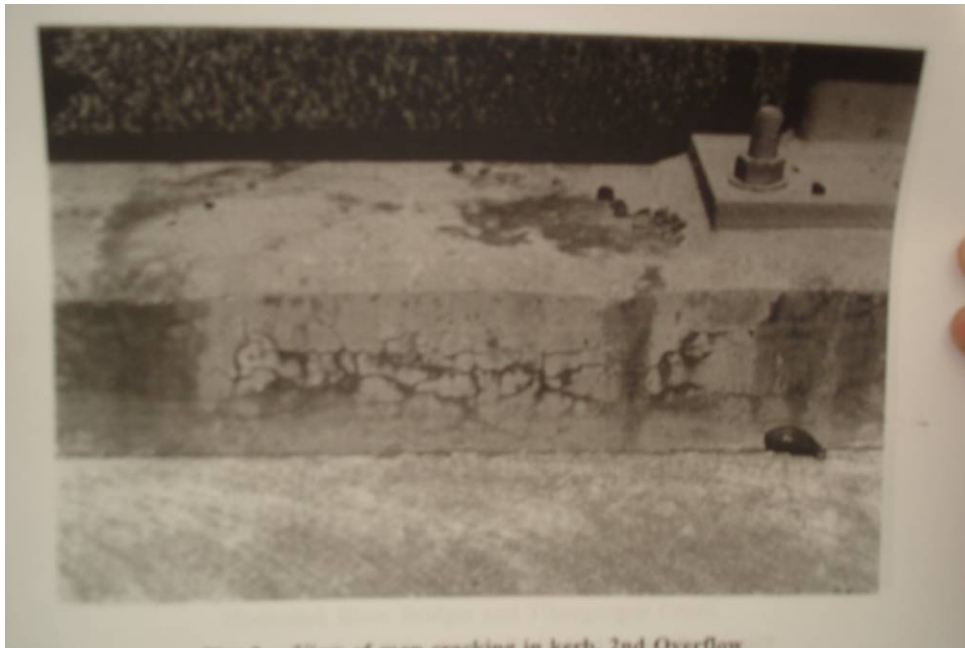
Typical ASR cracking in bridge kerbs (b) Longitudinal cracking plus map cracking at ends
